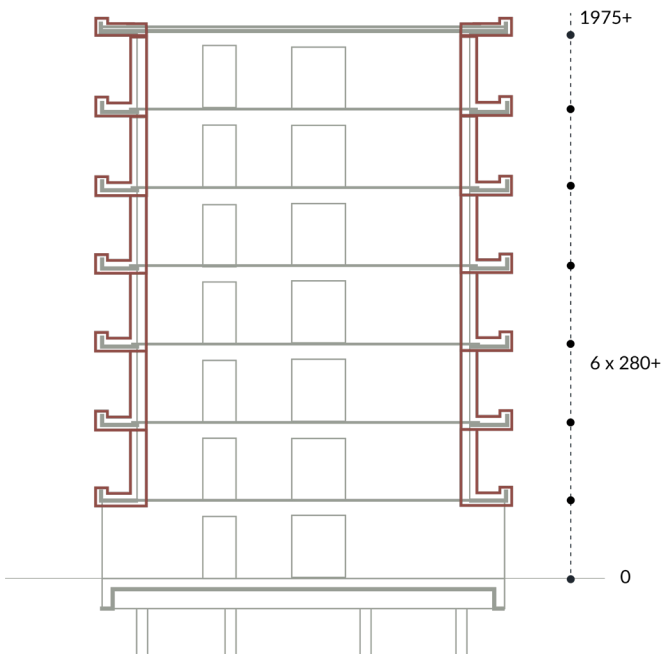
| Schematic Design of Wrap-around insulation for balcony and facade
